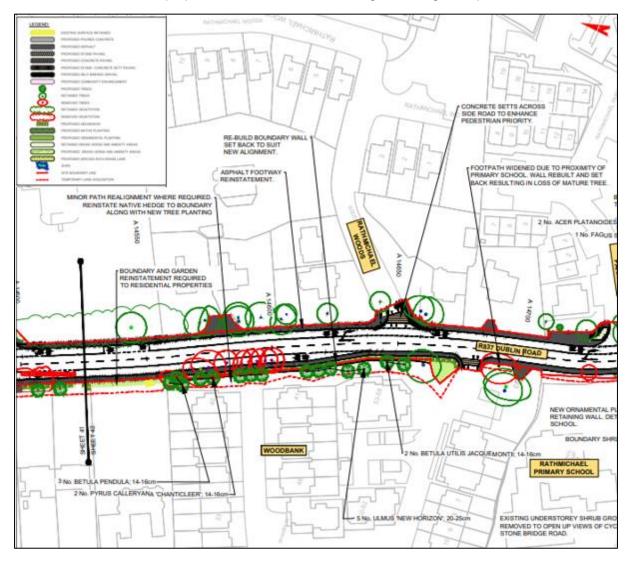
Extract from Landscaping General Arrangement Drawings at Woodbank (Sheet 42)
